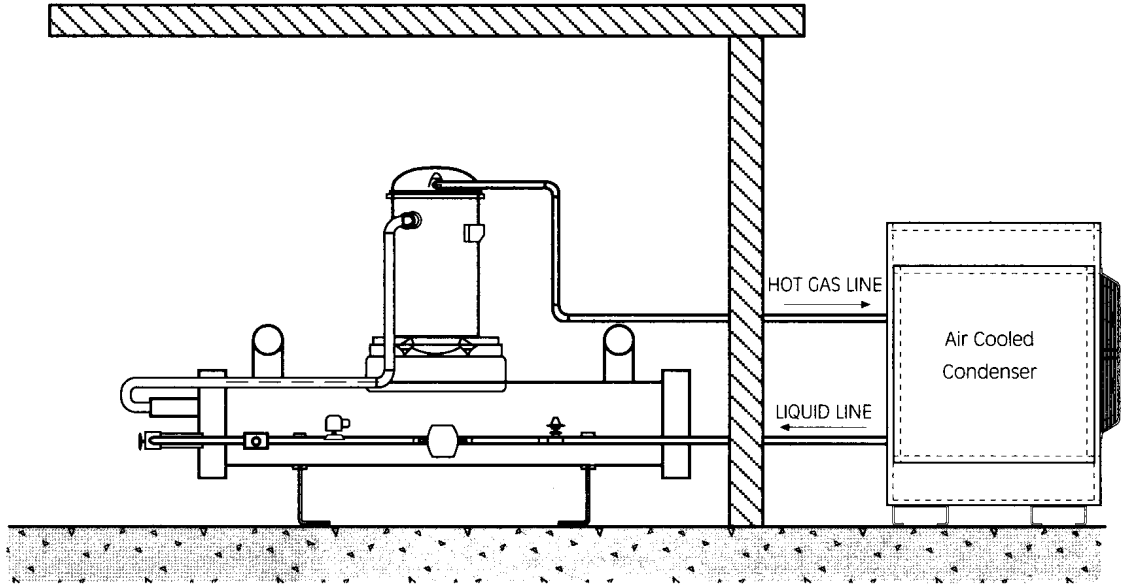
AIR COOLED SPLIT UNIT PROPOSED INSTALLATION
